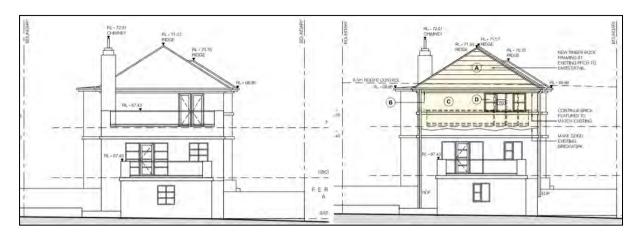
Existing North Elevation – EX200 A (left) and Proposed North Elevation – DA200 B (right)
